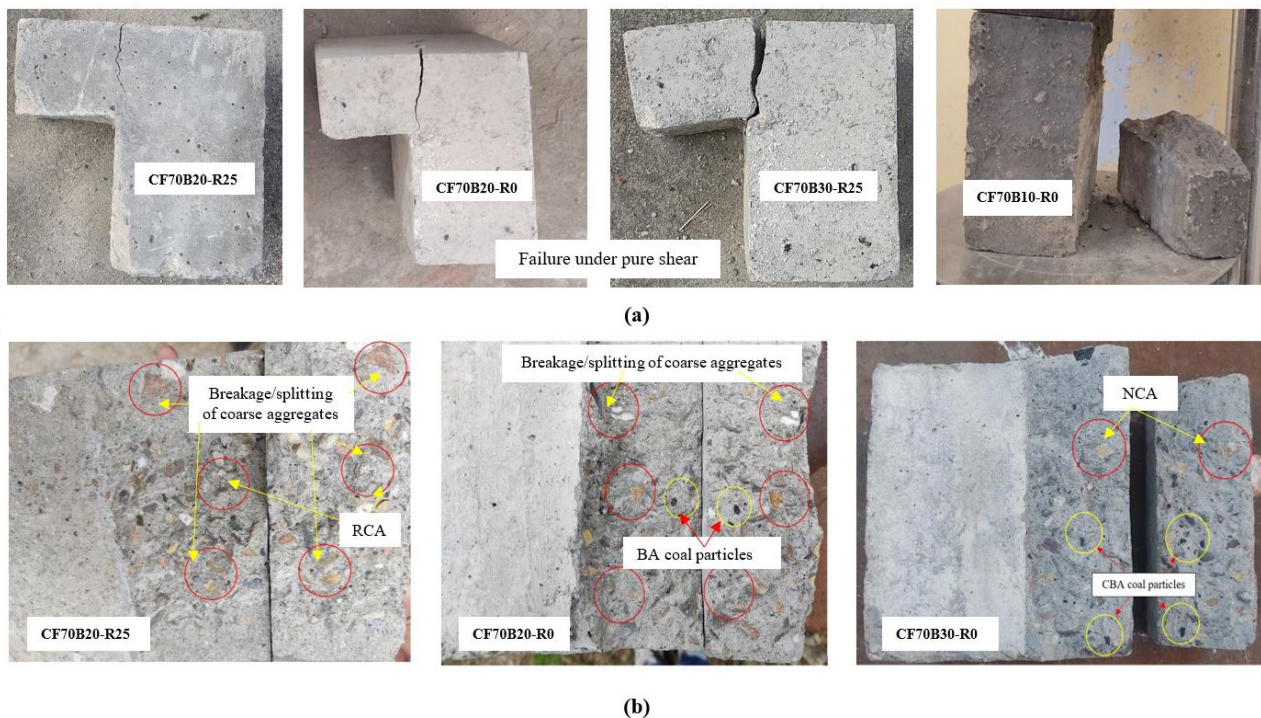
(a) Failure modes of tested specimens, (b) Interface photos after breaking the specimens about cracked plane (manually).
